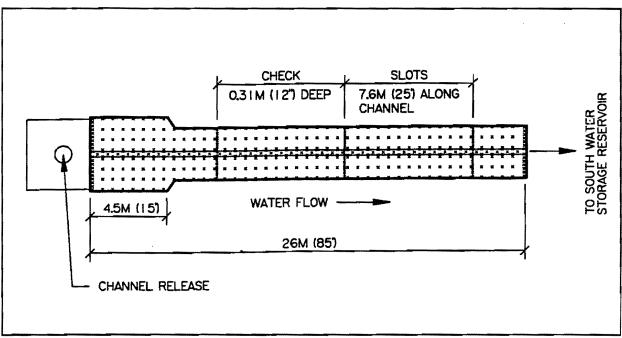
GREENSTREAK® PEC-MAT® Installation Plan.
